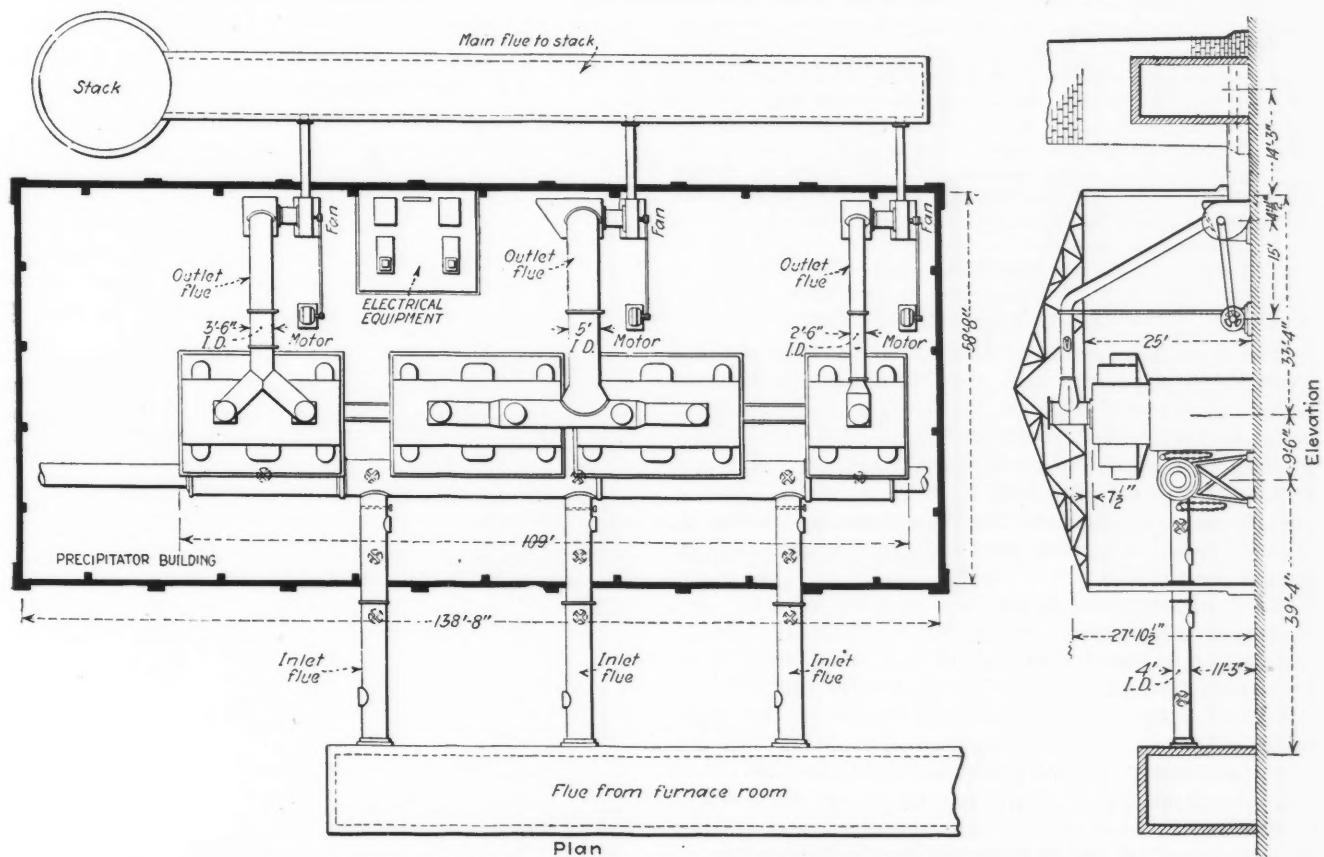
PLAN AND ELEVATION OF WILLIAMS-HARVEY INSTALLATION
